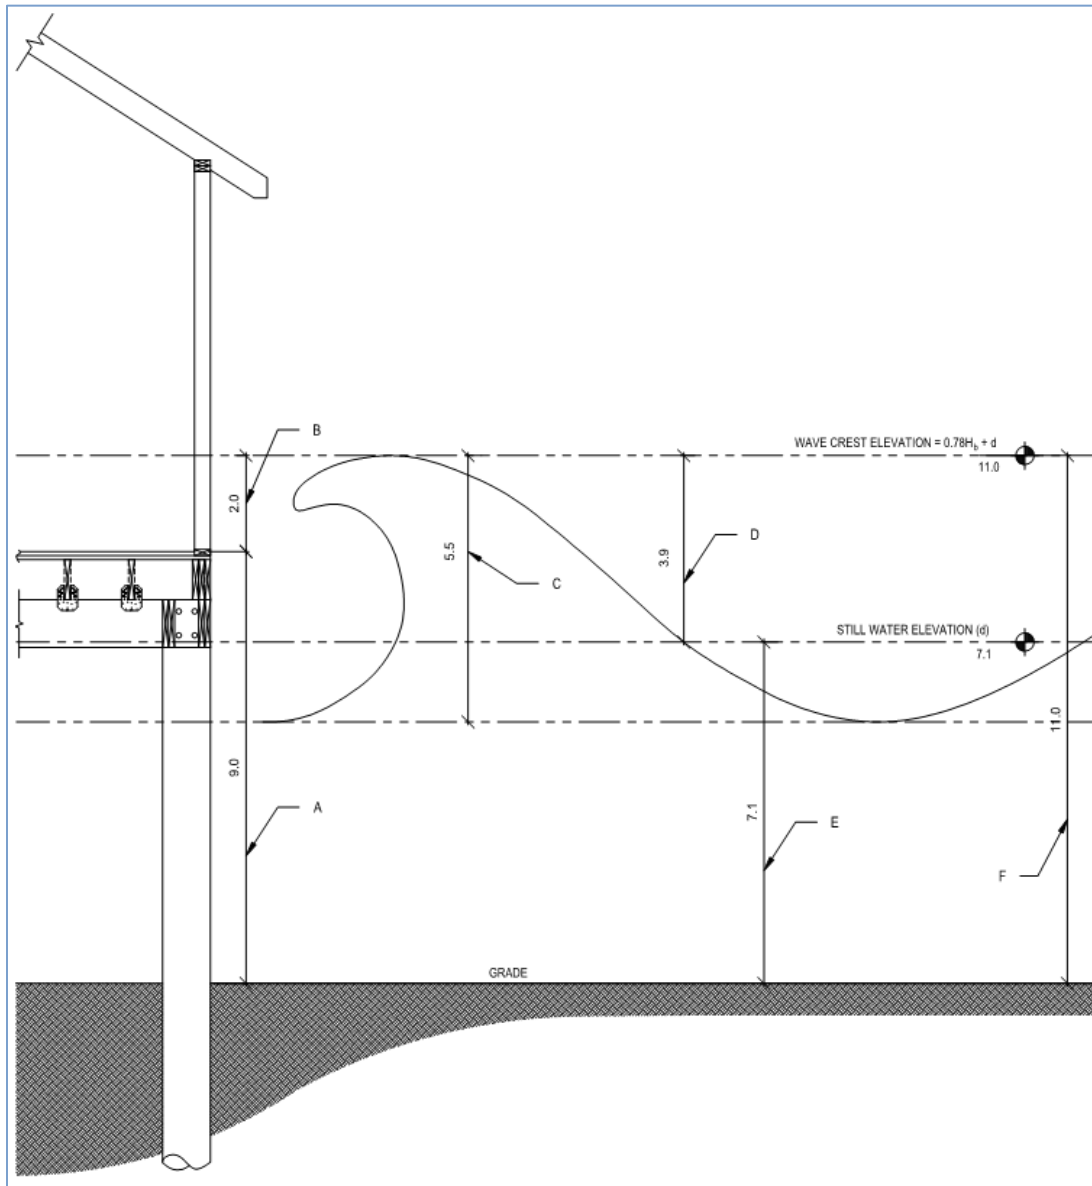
Illustration of Maximum Wave Damage Scenario, Prototype 7A Building on Open Pile Foundation, Most Likely Building Characteristics
